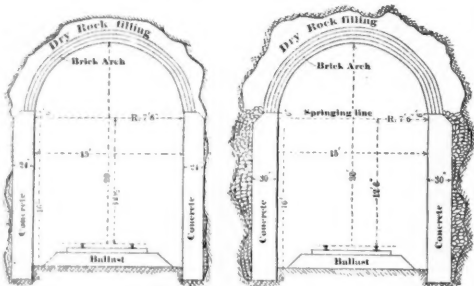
Minimum Section. Fig. 4.—Average Section. Permanent Work.
